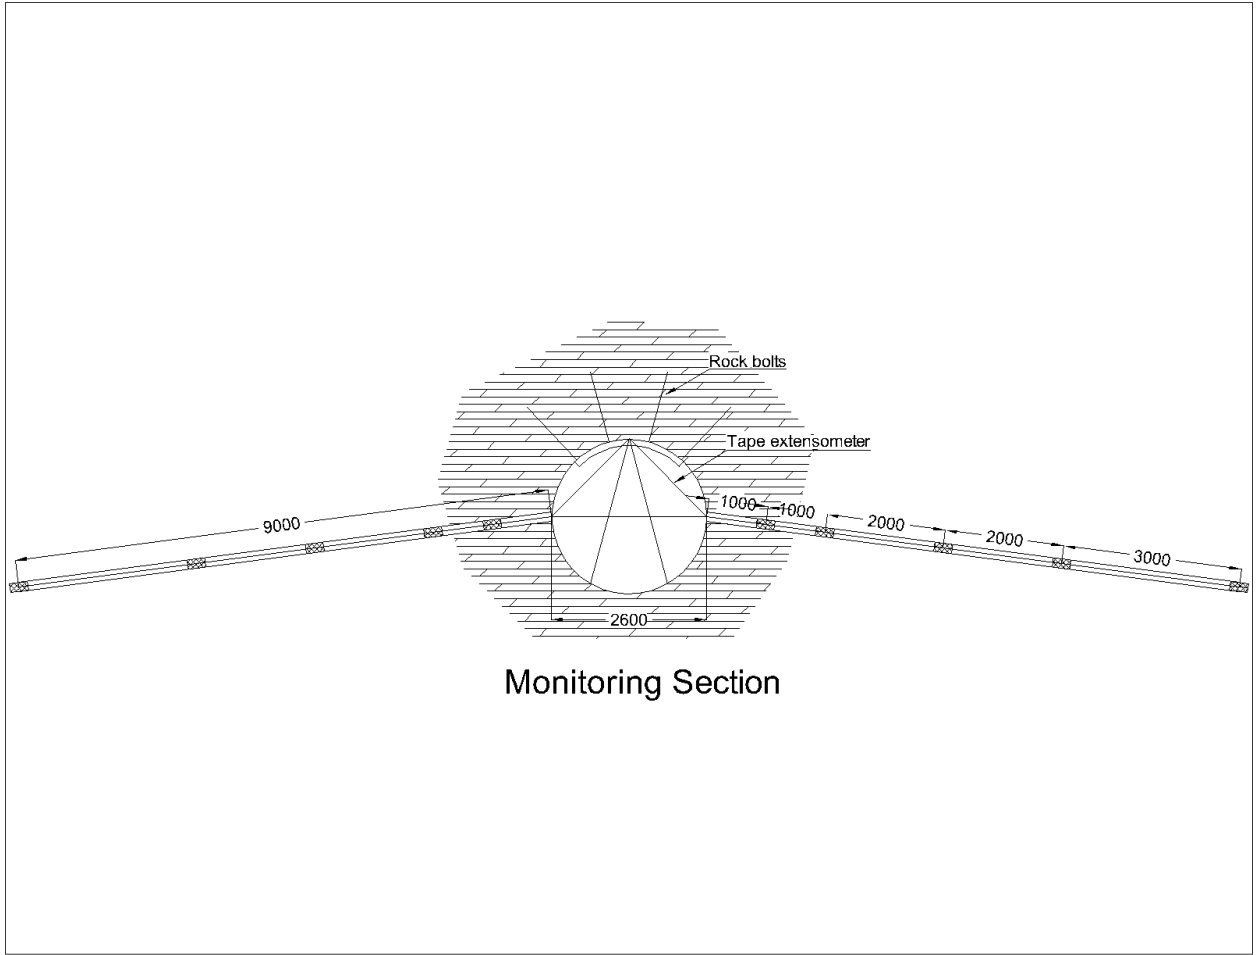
Monitoring section in tunnel showing borehole and tape extensometer layout (Dimensions are in mm).
